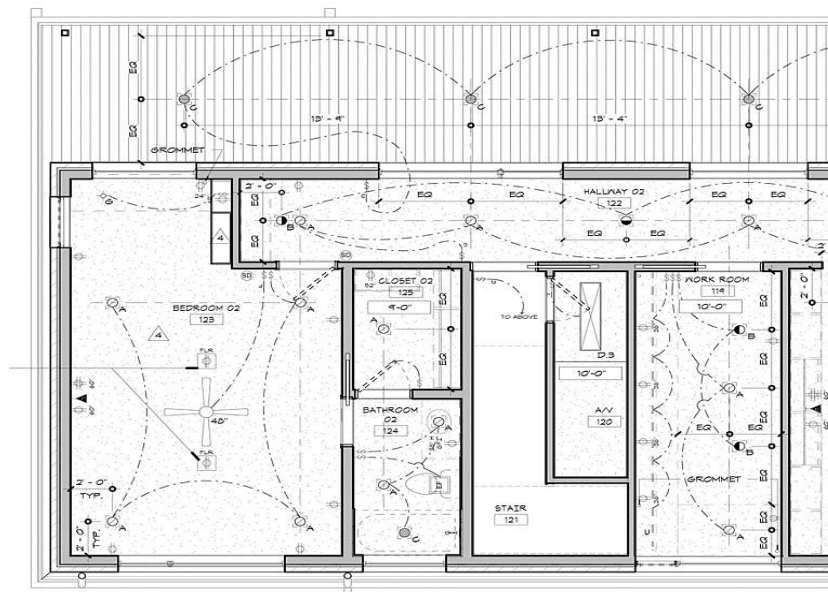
Example of a floor plan checklist for an architectural working drawing.
